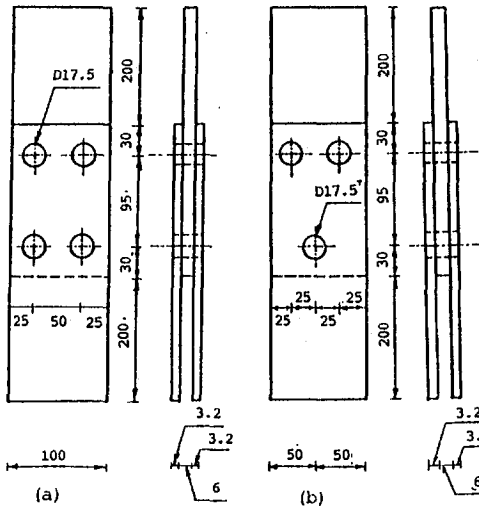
(a) Bolted specimens with 4 hole (B4), (b) 3 hole (B3)
